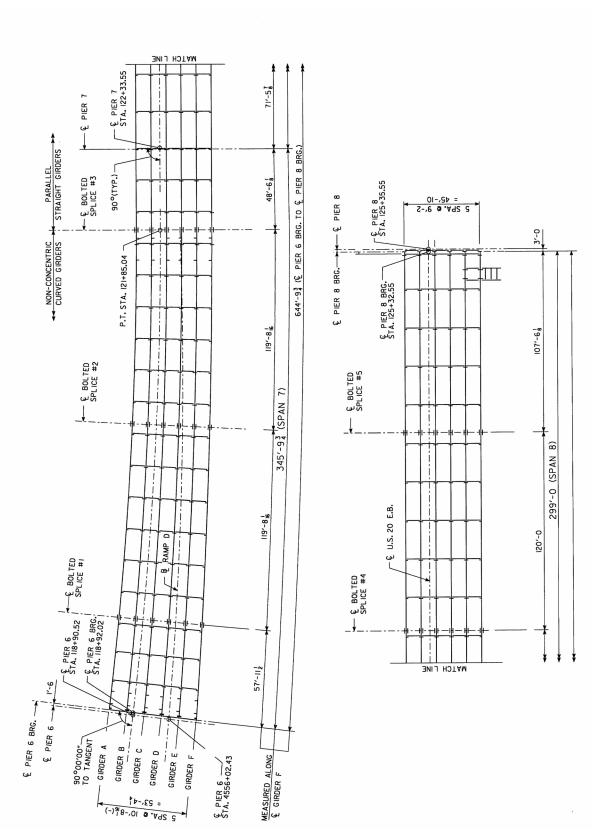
U.S. 20 Eastbound Iowa Flanking Bridge Framing
